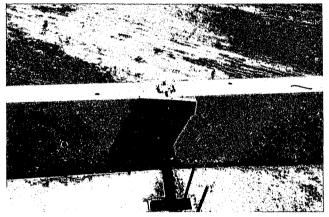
Vertical panel-to-panel joint is filled with a flowable non-shrink grout.
